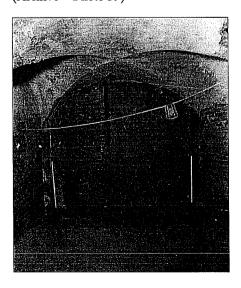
Store B39 showing vaulting cutting across blocked window in east wall. (Archive - Photo 34)
